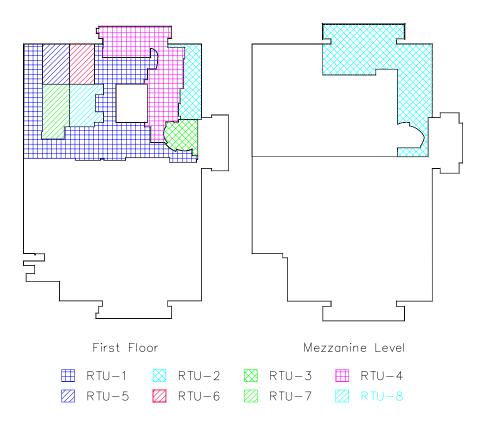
DOAS Rooftop Air-Handling Unit Zones
